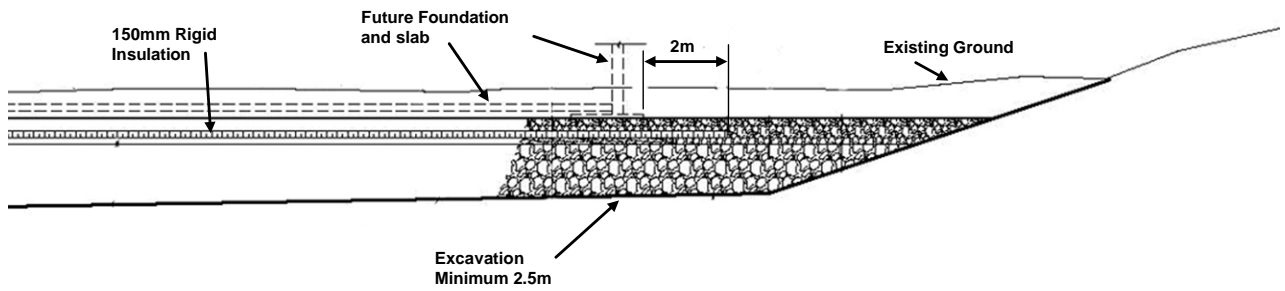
Excavation and backfill for Health Centre granular foundation, Pangnirtung, NU
